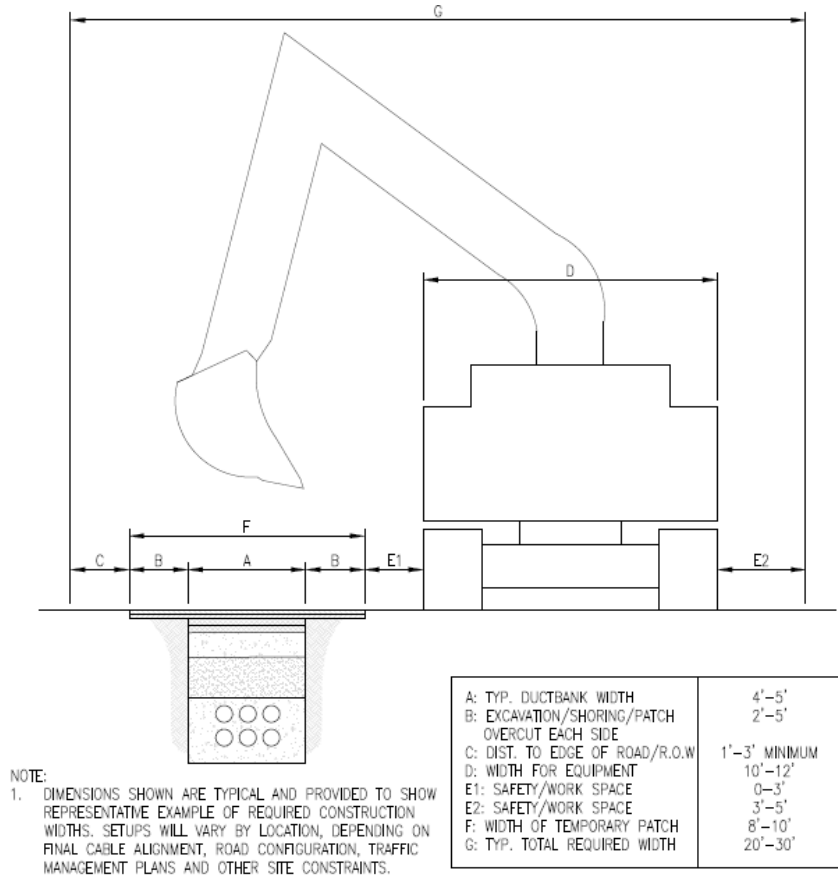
Typical Underground Onshore Transmission Circuit Installation within a Road Right-of-Way
